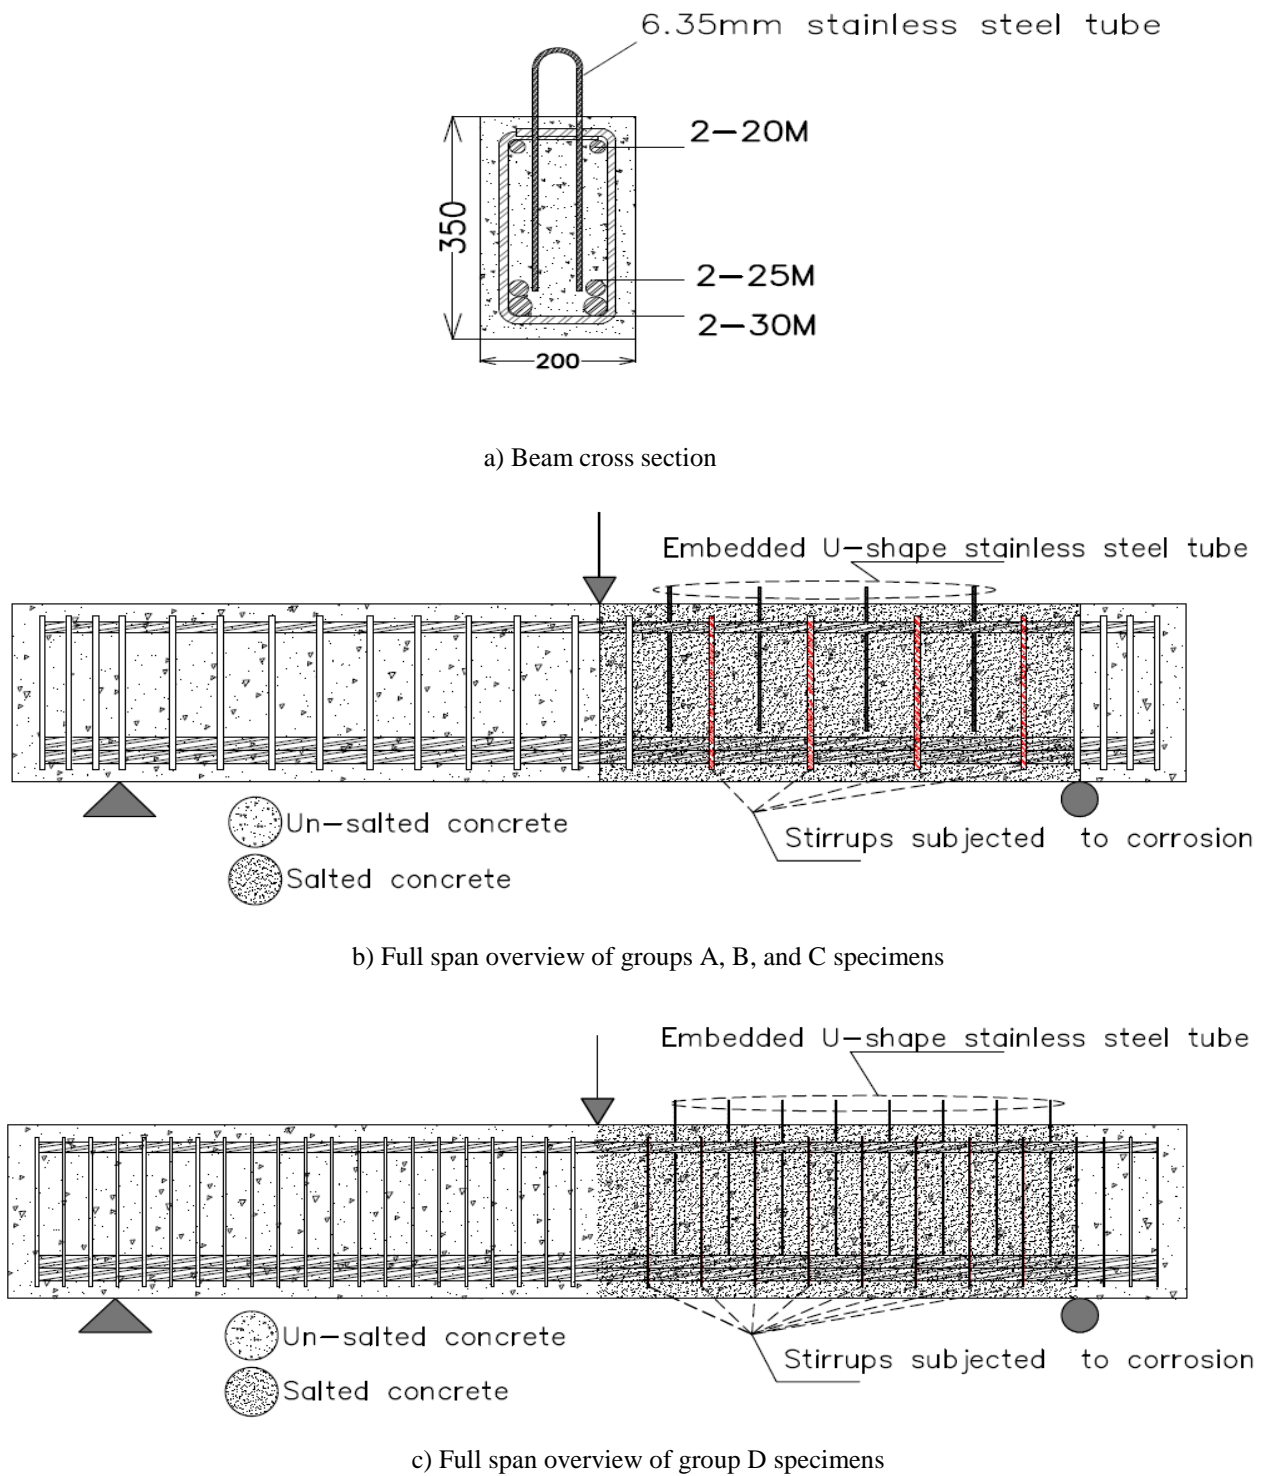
Corroded beam geometry and reinforcement details
